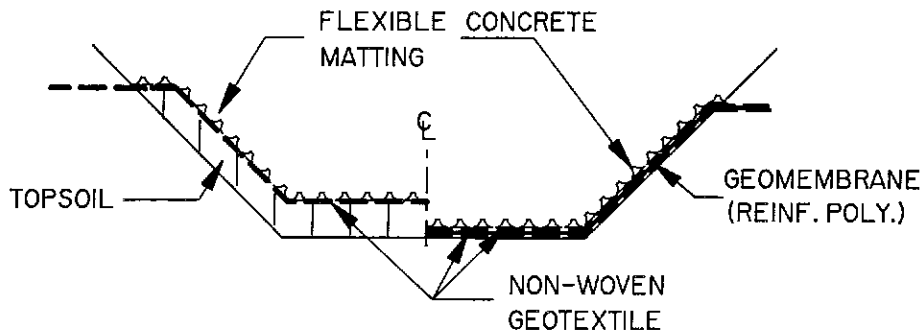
Use of Geotextiles and Geomembranes with Flexible Concrete Erosion Control Mat.
